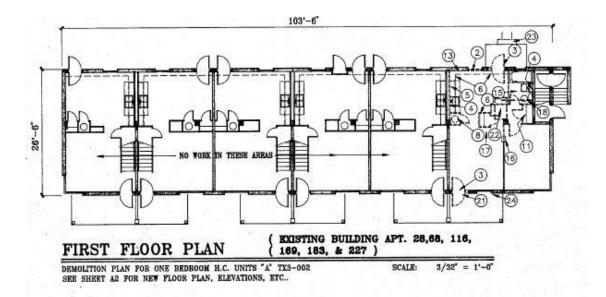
Key Plan locations of Interior Photographs, typical first story plan for Apartment Type A. Accessibility Alterations for Tays Complex – TX3-002 / TX3-003 / TX3-015A; sheet number A1 – Demolition Plans, dated March 1993. Courtesy of HACEP.
